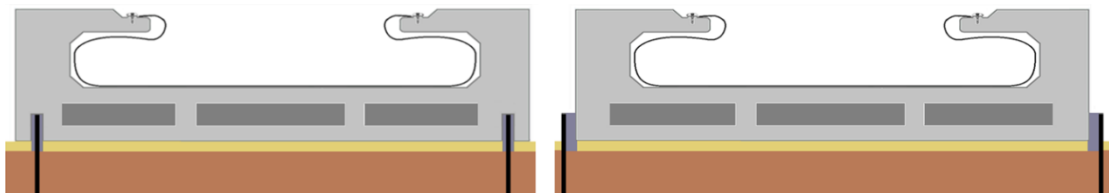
Underbase grout segment and infill segment with concrete or sand (2 different ways of placement).
